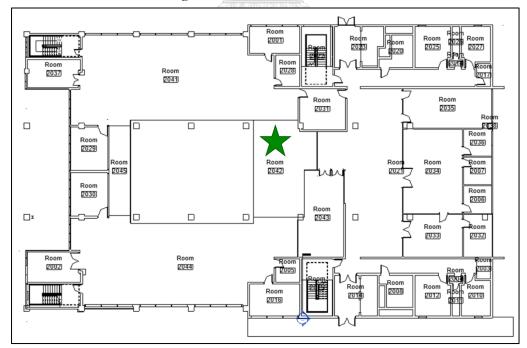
The floor plan of 2nd floor with respective Room numbers
